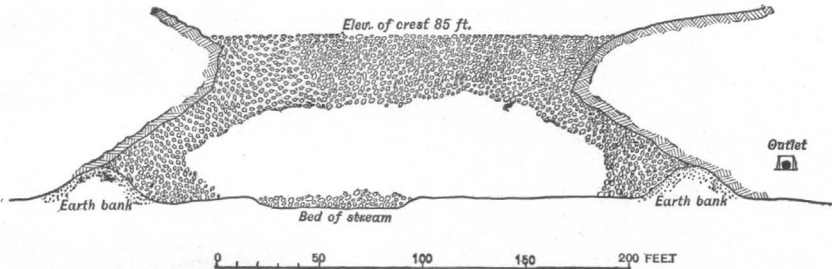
Upstream elevation, rock-filled dam, East Park dam site.
